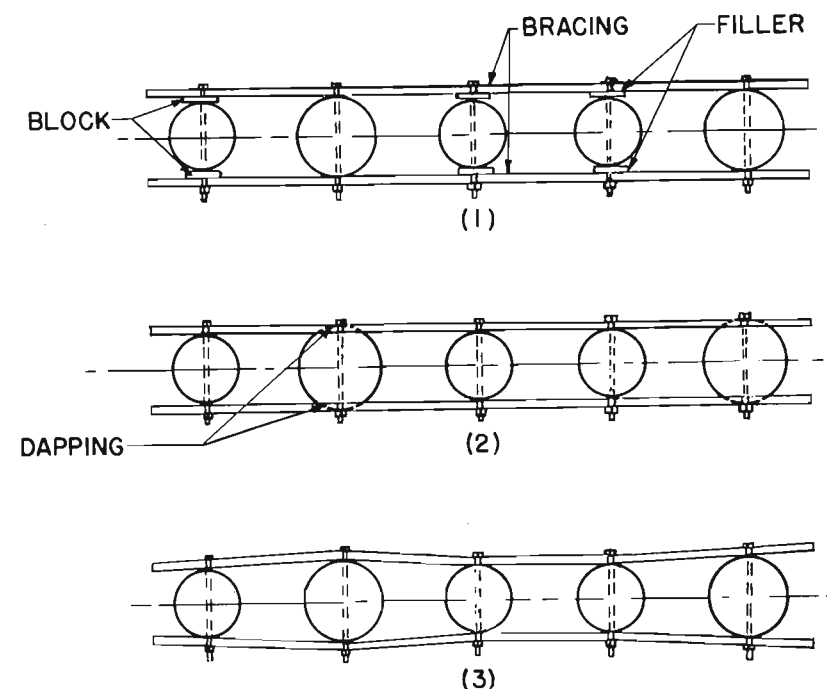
Methods of blocking and dapping piles for bracing to compensate for different size piles.
